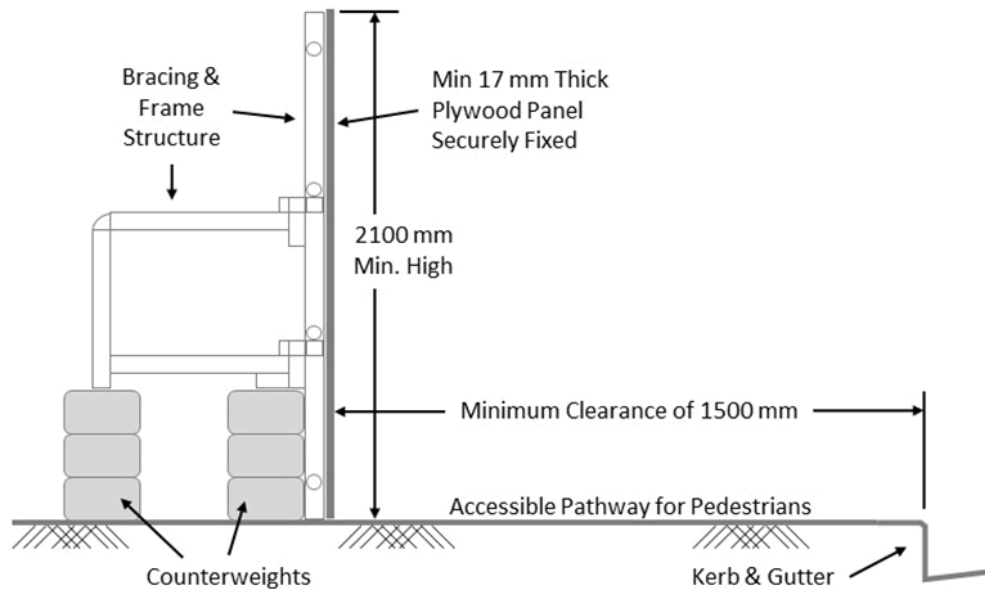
Typical Low Risk Type A Hoarding Section/Detail
